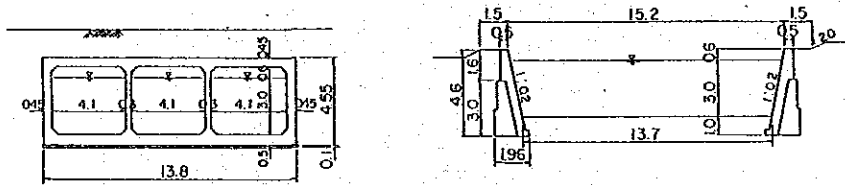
CROSS SECTION FOR IMPROVEMENT OF MME. LYNCH AVENUE CHANNEL
